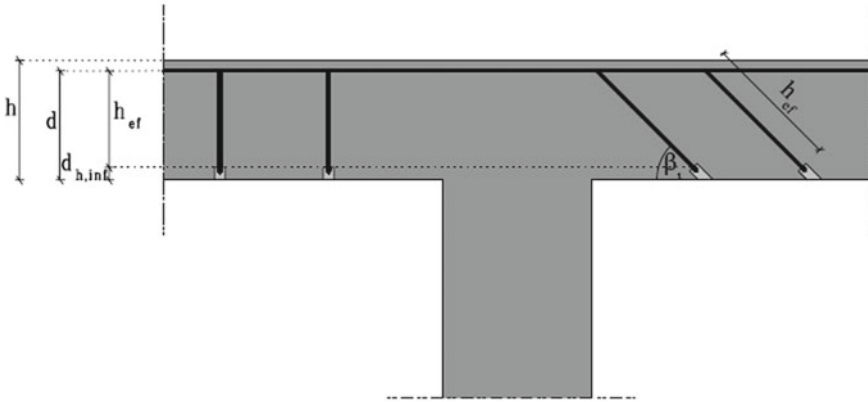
Geometrical properties of a typical test case, also exemplarily indicating the anchor configuration
